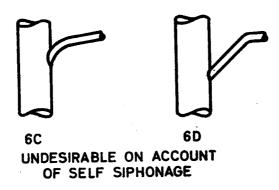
SINGLE STACK SYSTEM — WASTE-PIPE CONNECTIONS
